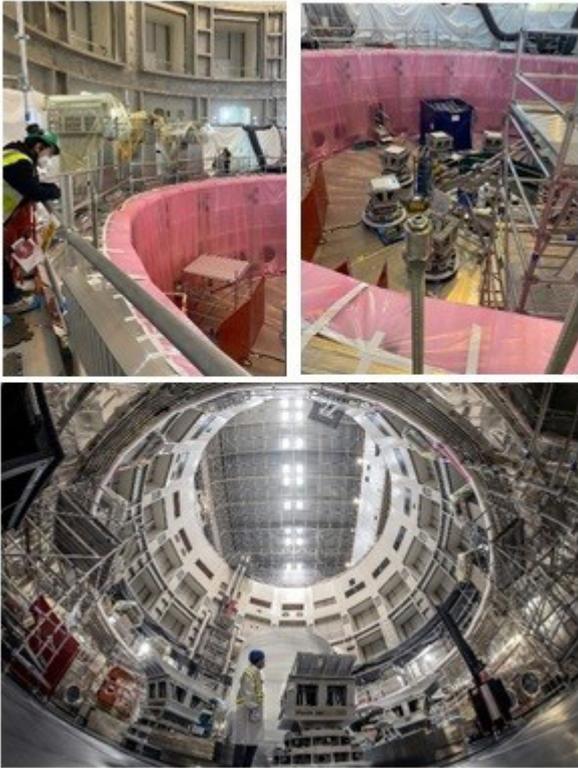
Welding the base section to the lower cylinder in the tokamak pit.
